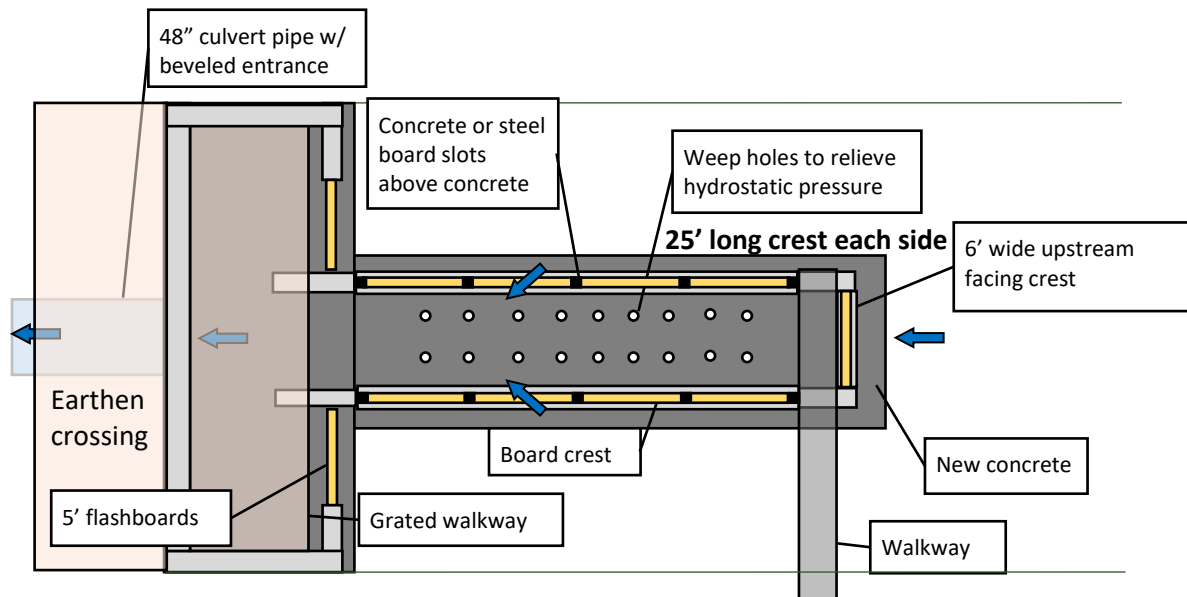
Conceptual plan view of example LCW structure to be constructed to replace the existing flashboards just downstream of the new flow control structure (not to scale)
